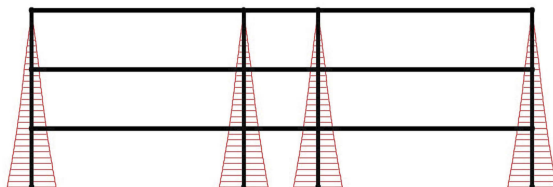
Precast frame with hinged beam-to-column joints: envelope of bending moments on columns.
